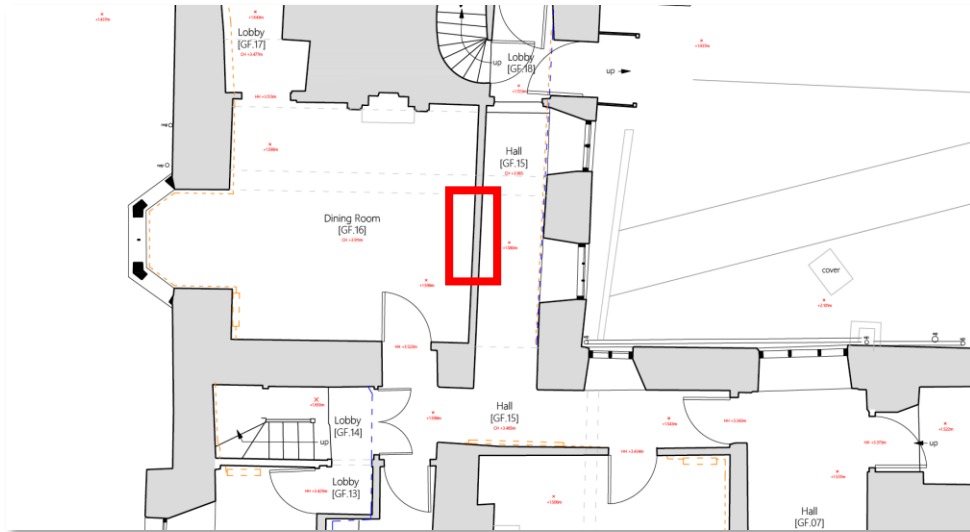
Location of works – Ground Floor (Fig. 11).
